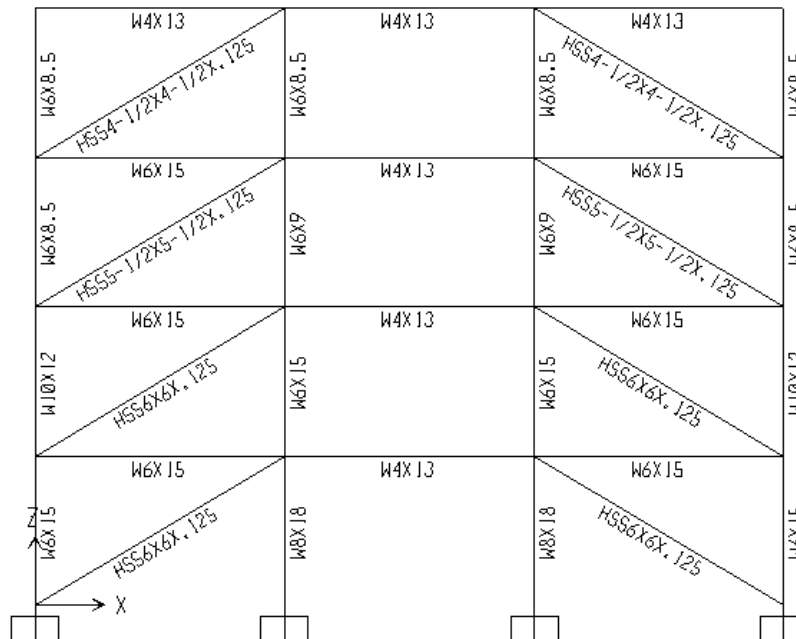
Design Sections of 4-story Diagonal braced frame.
